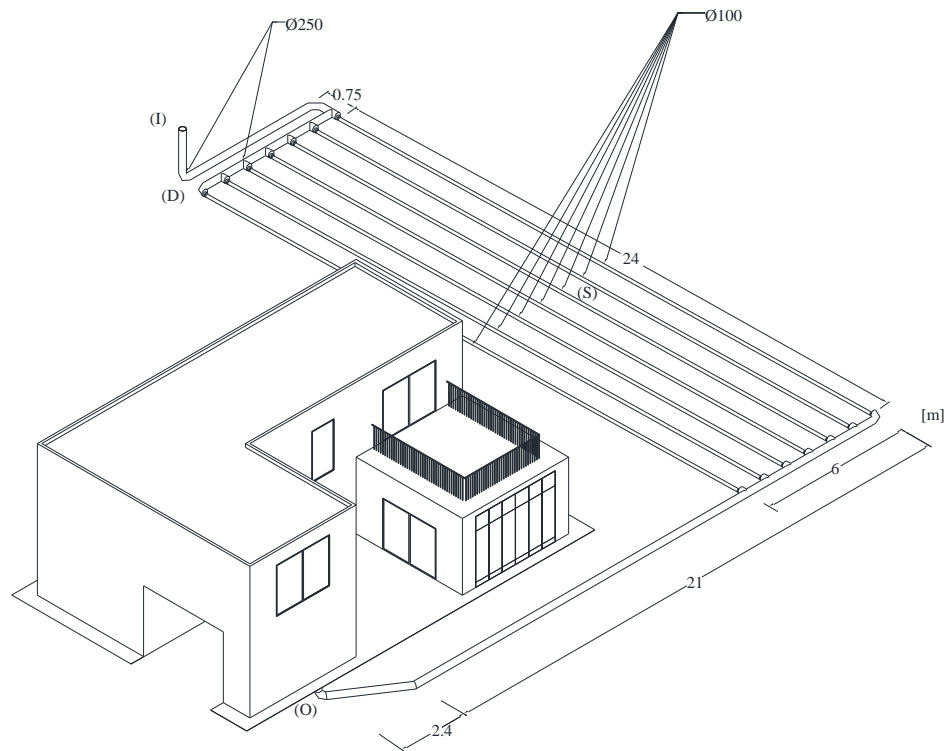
Buried pipes layout of the EAHE system and building location.
